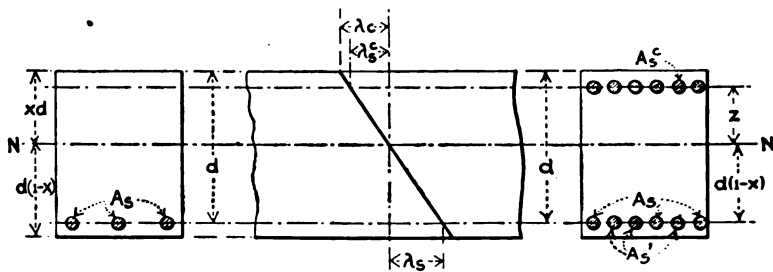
Stress Strain Diagram of Beam with Double Reinforcement.
